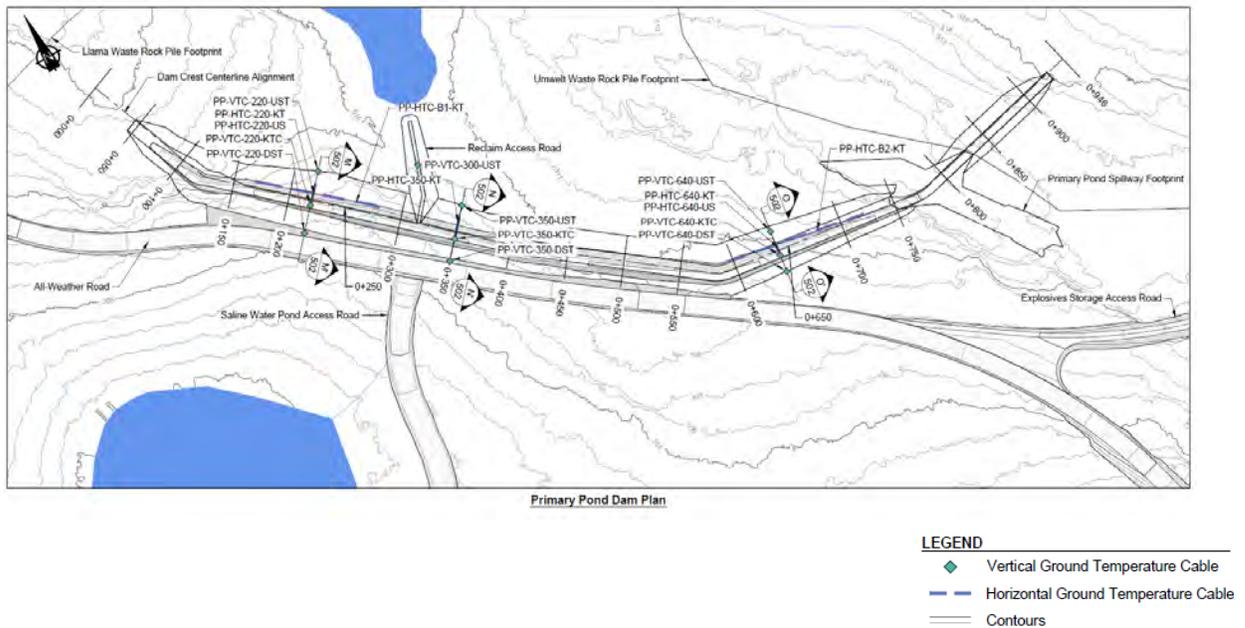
GTC Monitoring at the Primary Pond - Plan View
